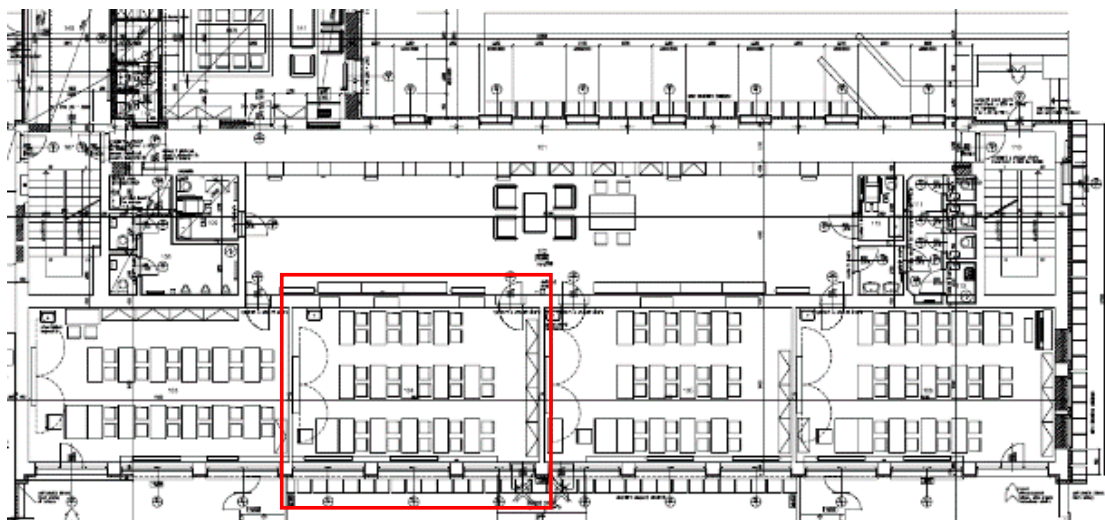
Part of the plan of the ground floor of the east wing of the school building with the studied classroom.
